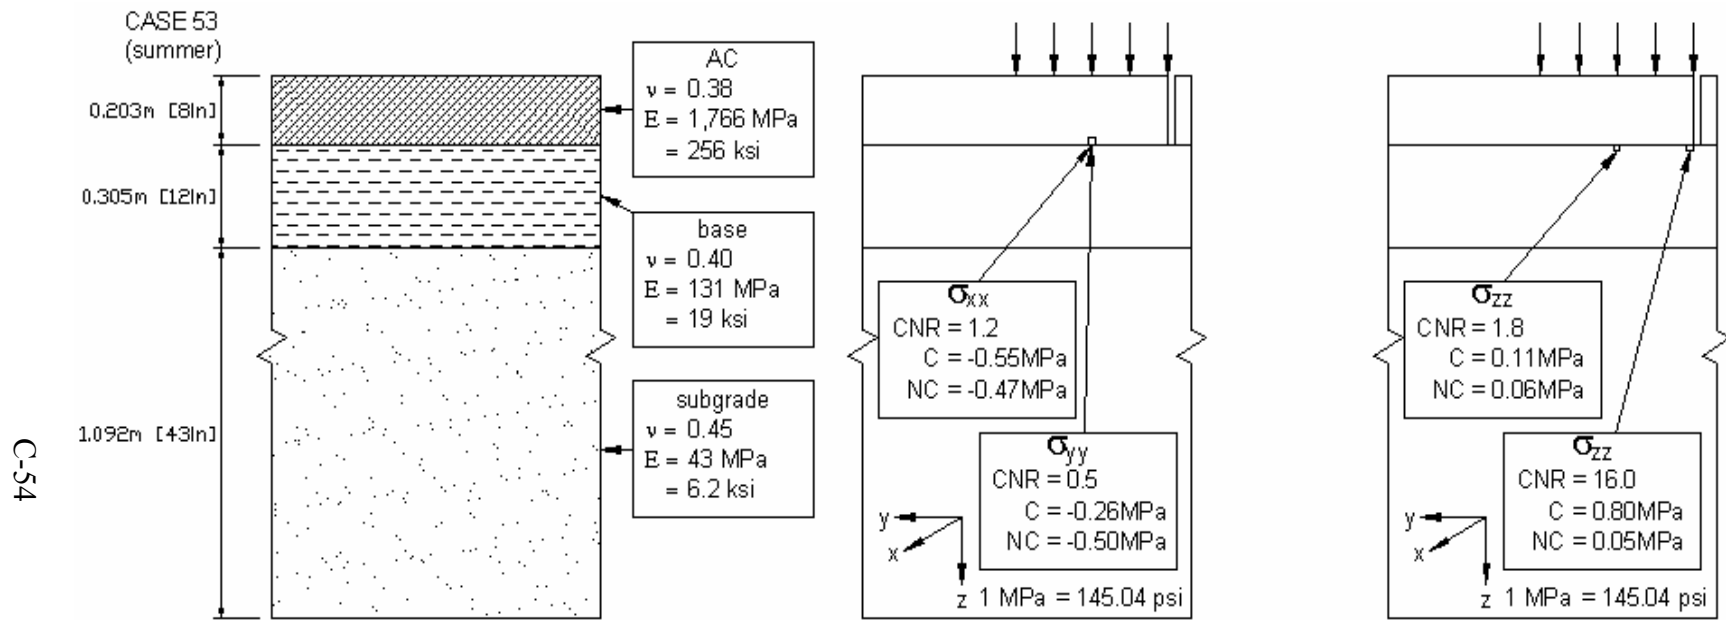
Summary cross section for case 53, (C – stress in cracked pavement, NC – stress in pavement with no crack, CNR – crack/no crack (stress) ratio)
